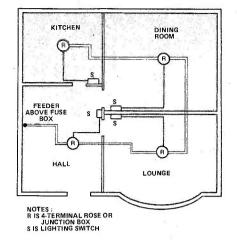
Typical ground-floor lighting circuit of a medium sized house.
